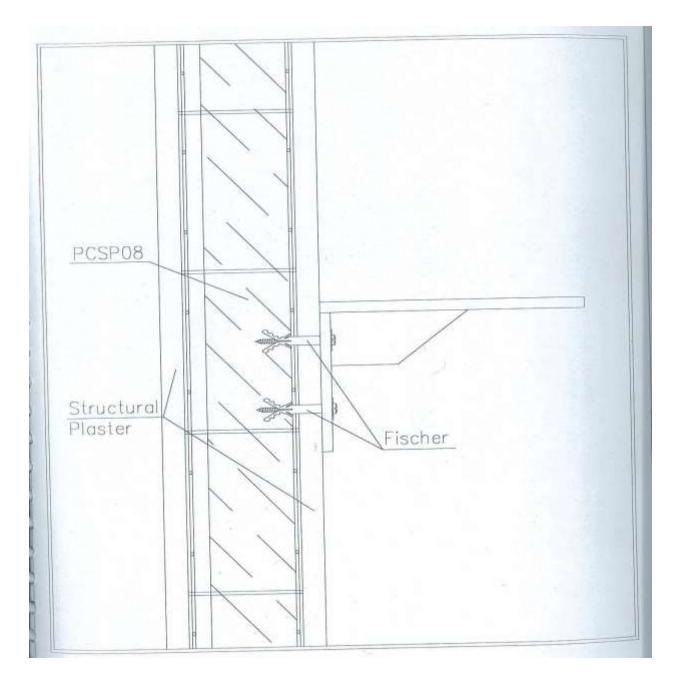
Building Details for Single Panel – Fisher & Plaster Detail
